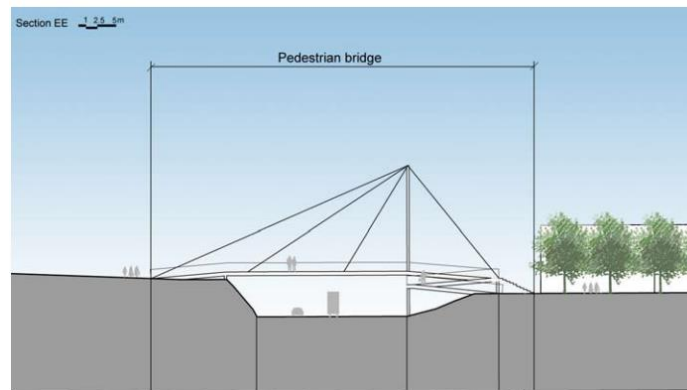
Illustrative plan of proposed new bridge over the A461.
